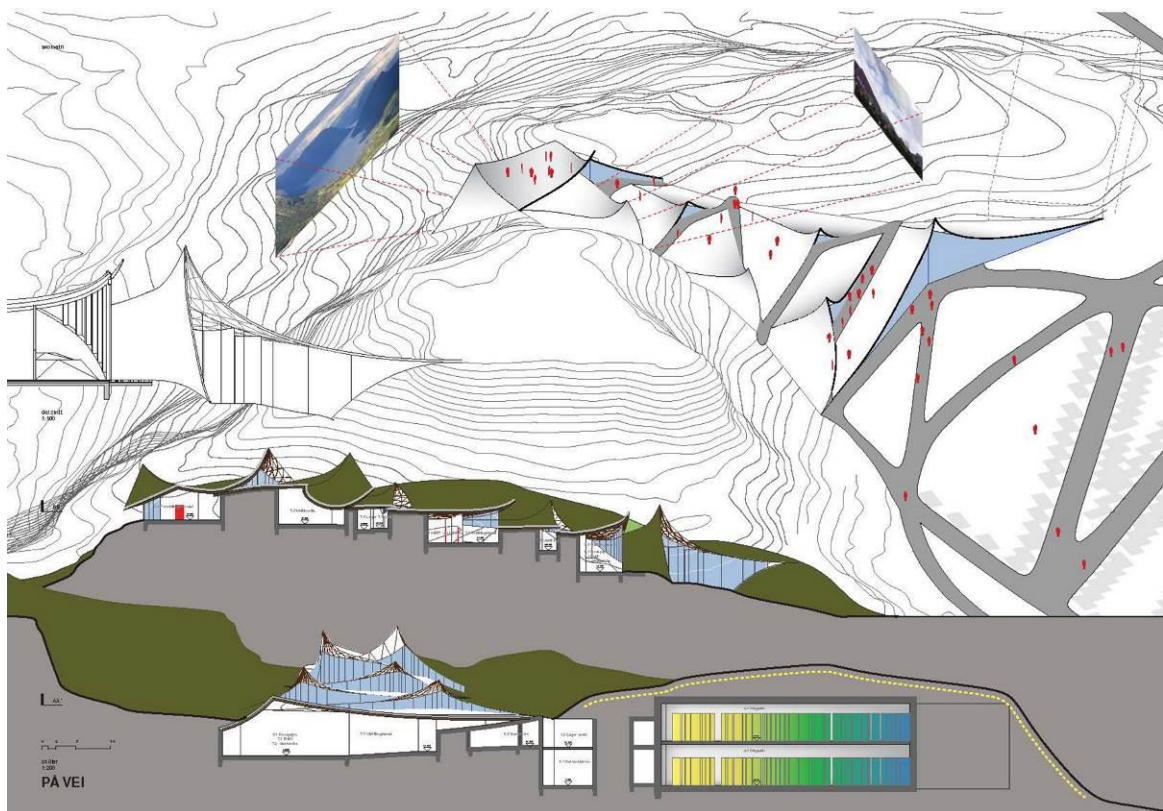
PÅ VEI, from up to down: axonometry, detail and sections
